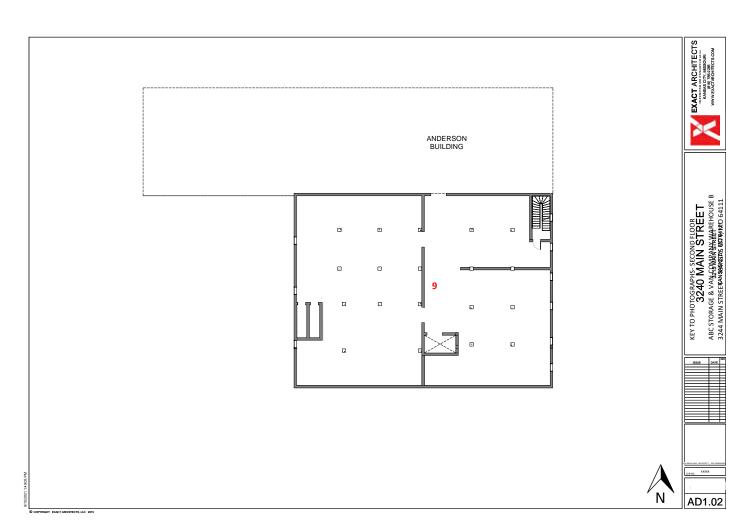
ABC Storage & Van Company Warehouse B current floor plan and key to photographs, second floor.
